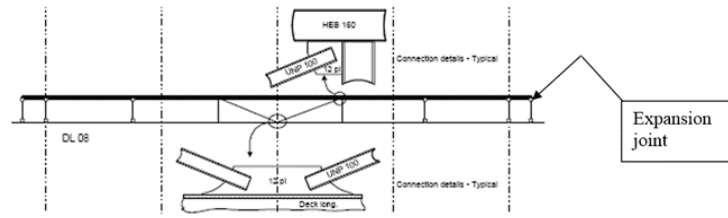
Recommended sketch for repair / modification on the pipe supports.
